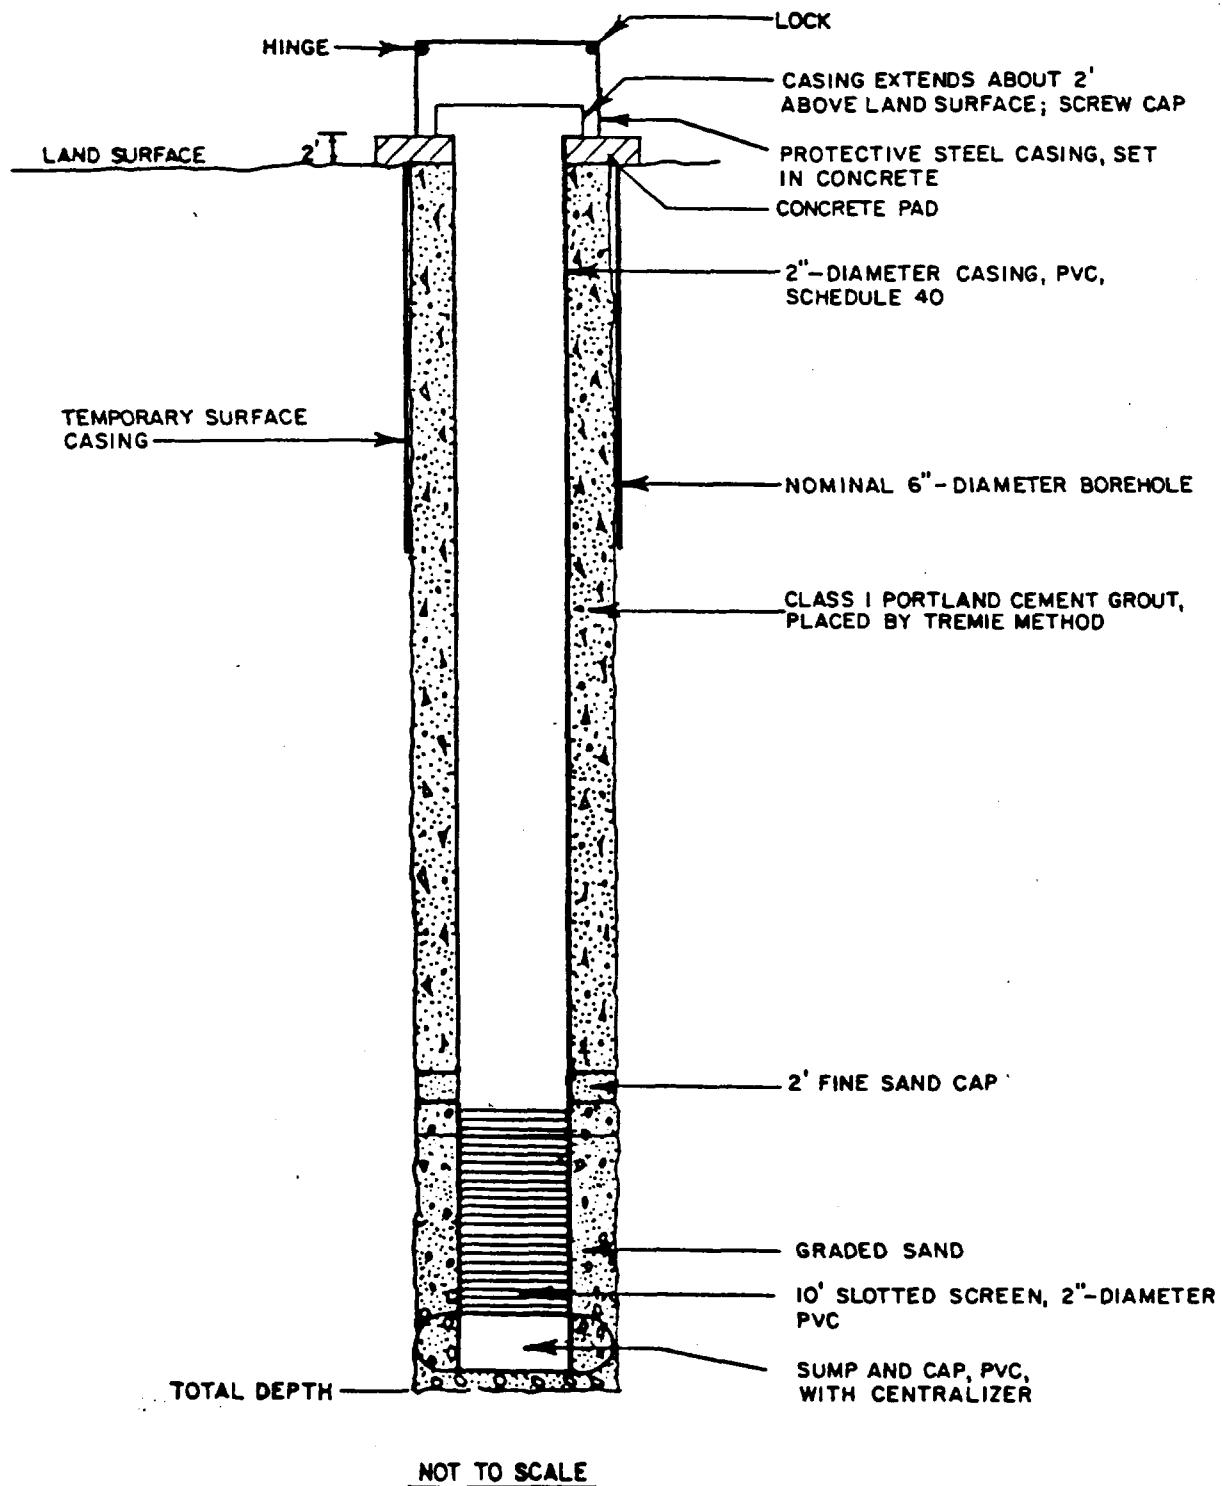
Monitor Well Construction Details, Roto-Rooter Drain and Sewer Service, Hillsborough County, Florida
